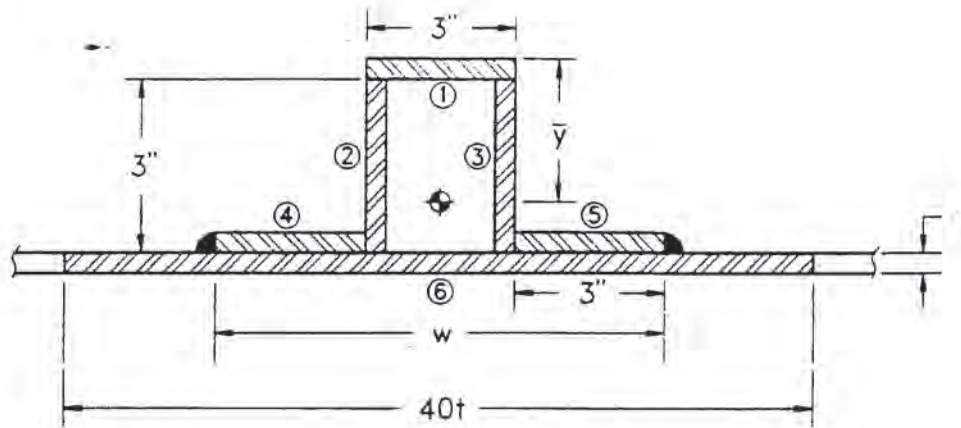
Cross section of ring stiffener and tank wall. If w is greater than $20t$, the maximum length of wall usable is $40t$.
